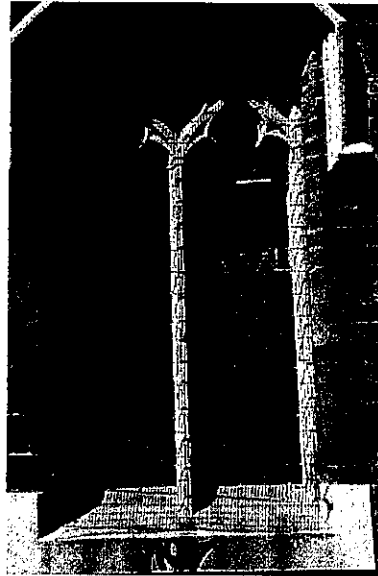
Exterior, north elevation. Detail of window 7. This window appears to be largely intact
